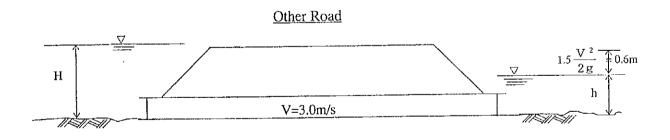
Cross Section of Bottle-neck Portion on other Proposed Road
